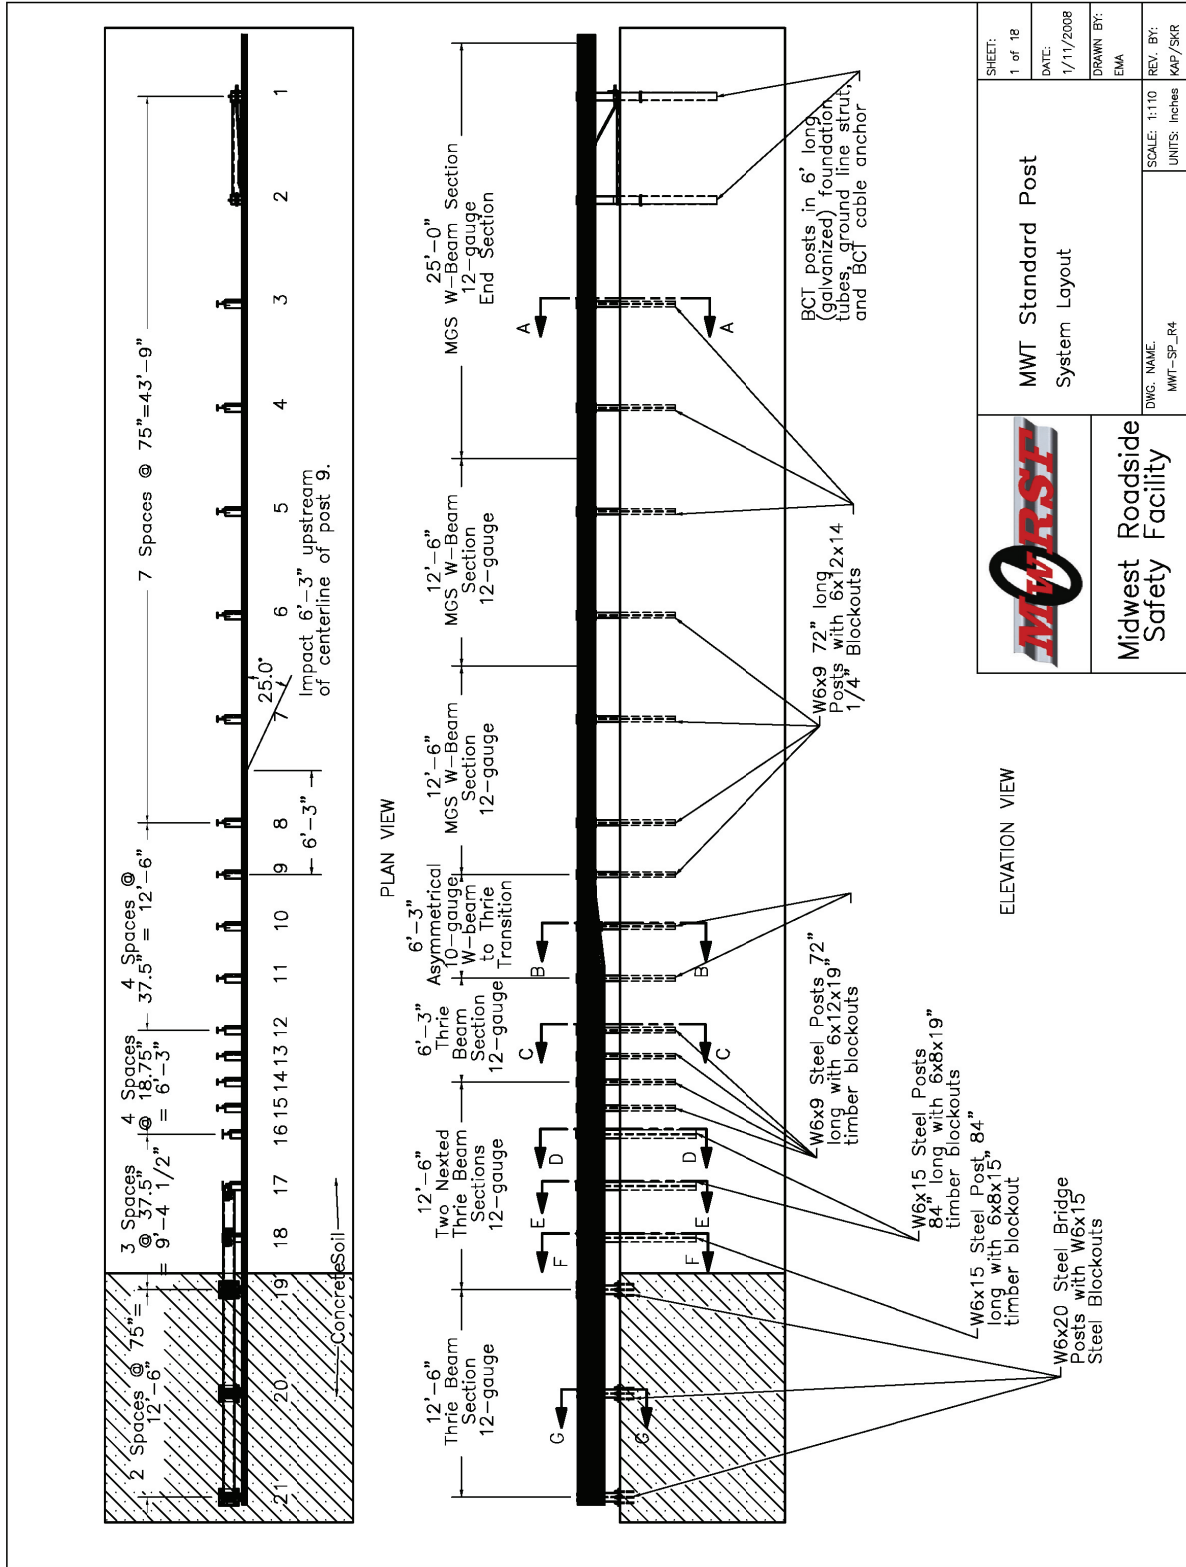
System Layout, Test Nos. MWTSP-1 and 2
